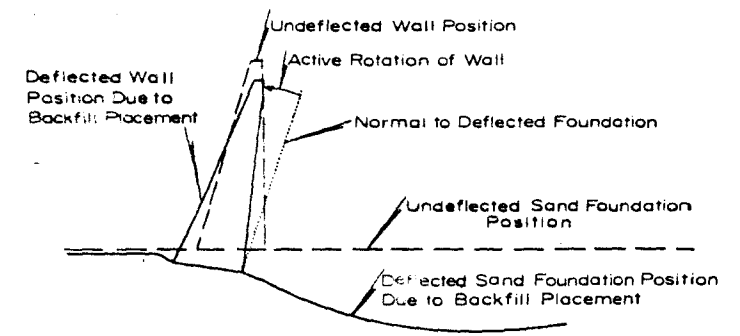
WALL AND SAND FOUNDATION DEFLECTIONS DURING BACKFILL PLACEMENT
